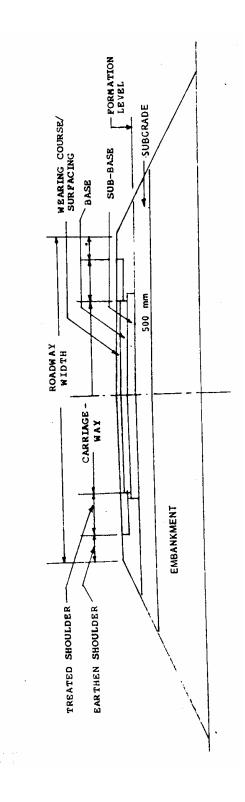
Terms used in the specifications to describe road cross-section elements with a flexible pavement.
